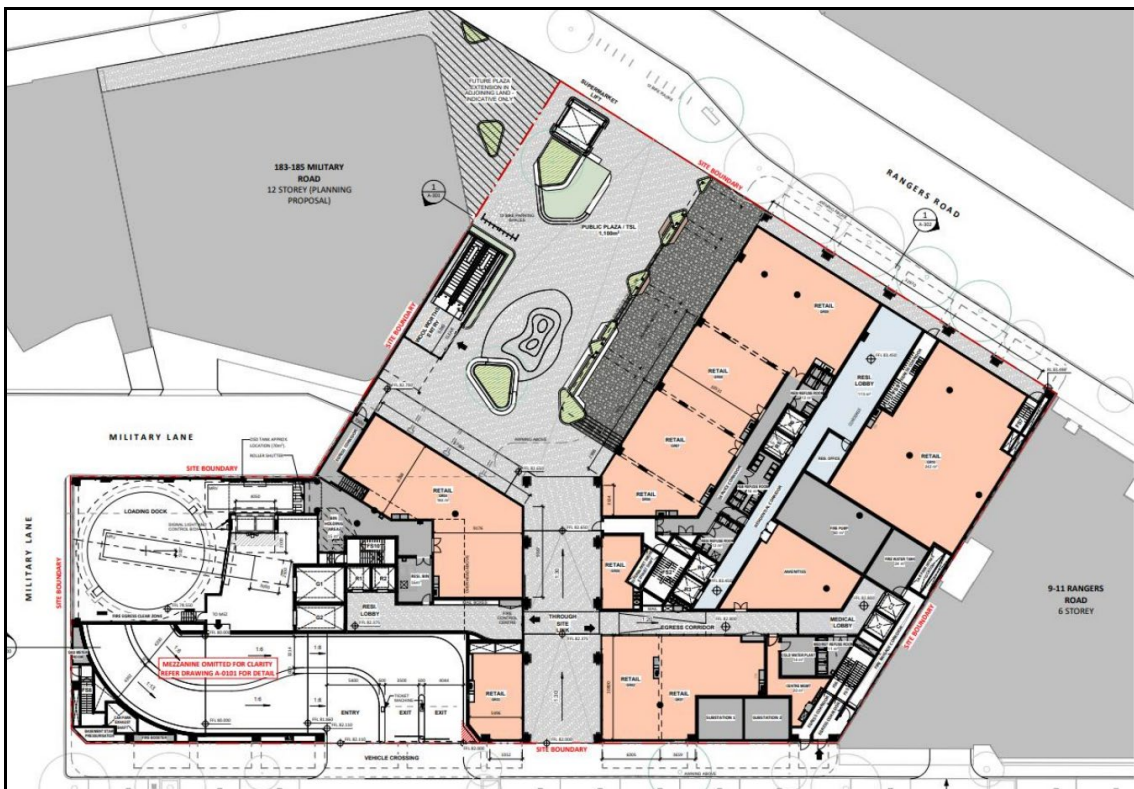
Ground floor plan showing the proposed part plaza - SSD 82875708
